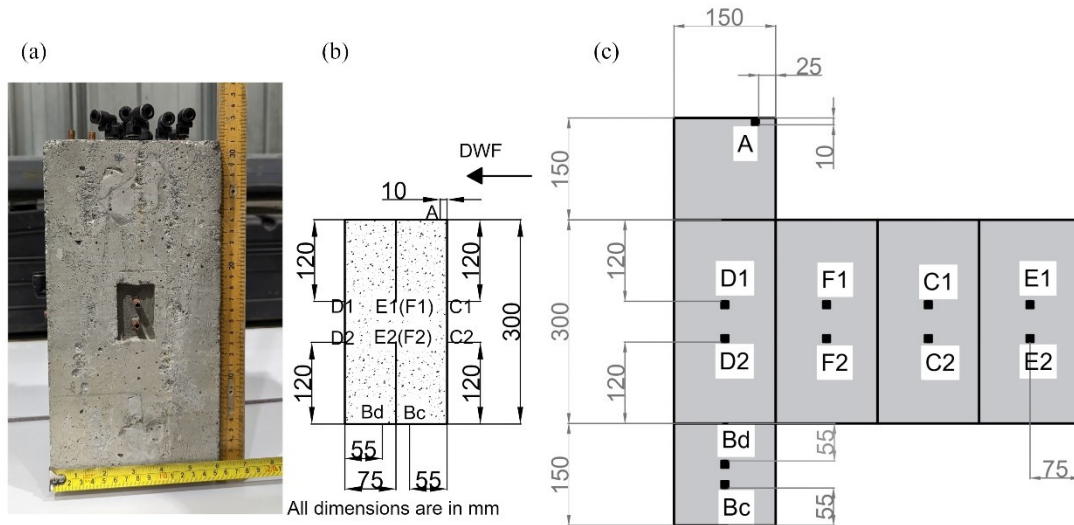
Instrumented block showing the position of water inlets: (a) Concrete block with water inlets and outlets; (b) Schematic diagram of the instrumented block with letters indicating the water inlets; (c) Development of the six faces of the instrumented block
